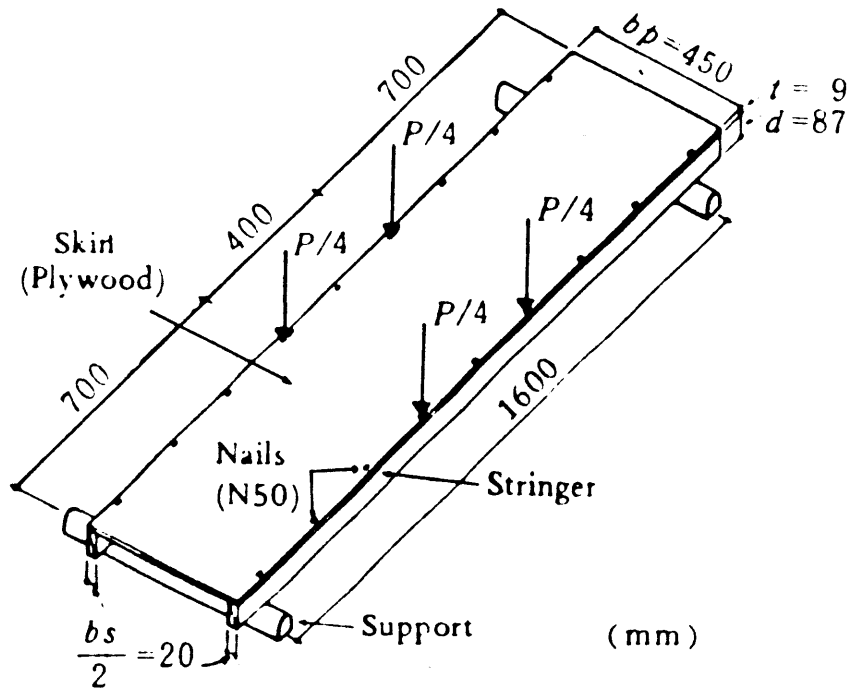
1 Dimension of stressed-skin panel and the method of loading.
